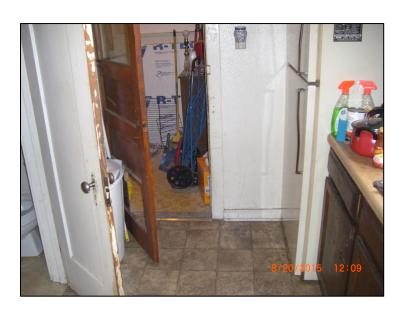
Suspect ACM vinyl sheet flooring inside 119 N. 22nd Street.
